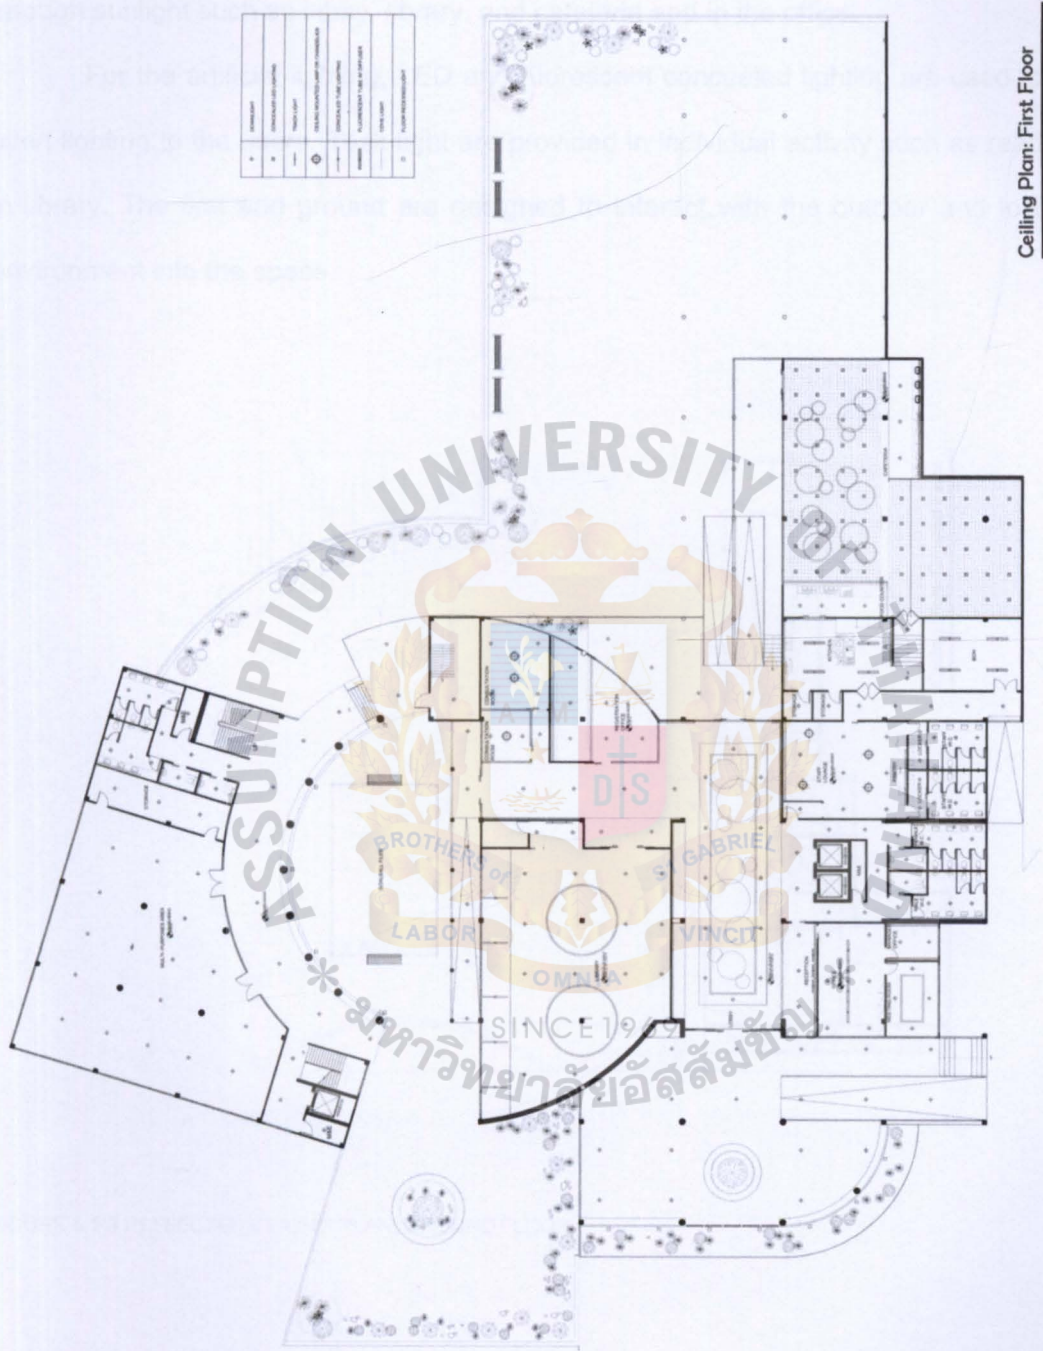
REFLECTED CEILING PLAN: 1ST FLOOR
